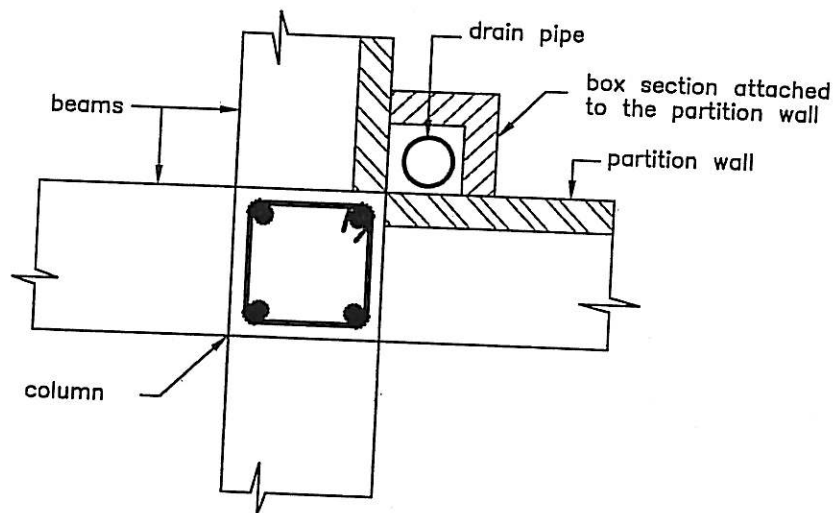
Rain water pipe outside column's section passing through corner of the slab covered in hollow box section
